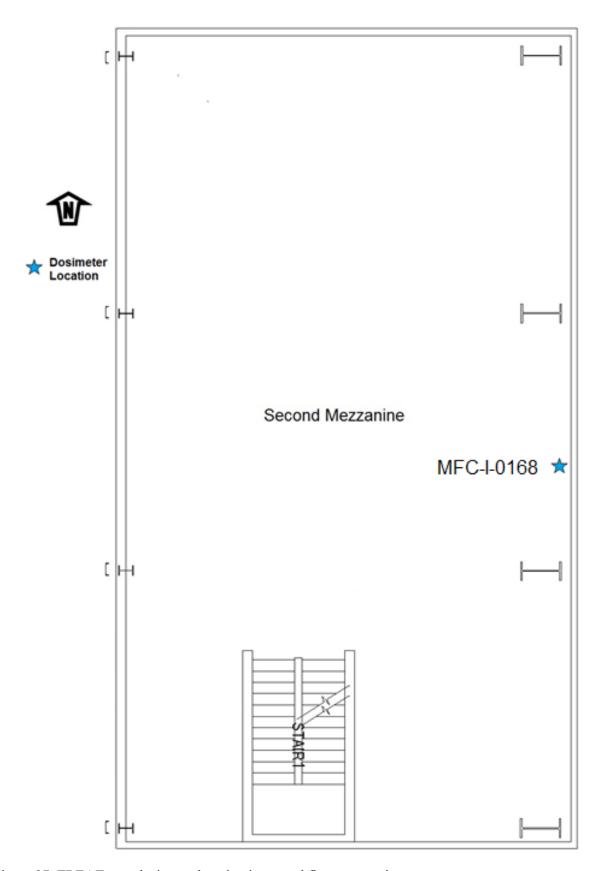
TREAT area dosimeter location in second floor mezzanine.
